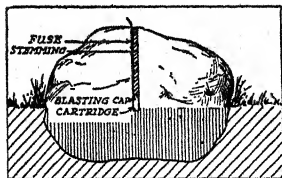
For shattering a large boulder by the blockhole method the hole is drilled about halfway through the boulder, carefully loaded, and tightly tamped
